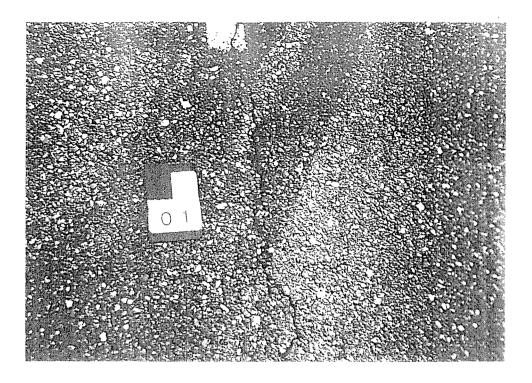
"Before" - Loose Debris and Dirt Film Removal Using Vacuum Wethod
